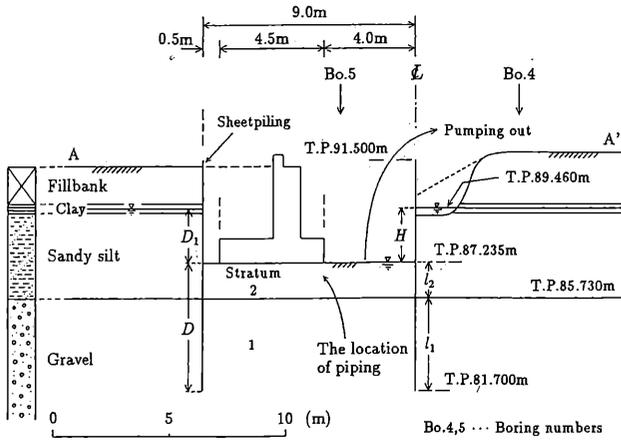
Modeling of the foundation ground subjected to piping (Left bank downstream abutment).
